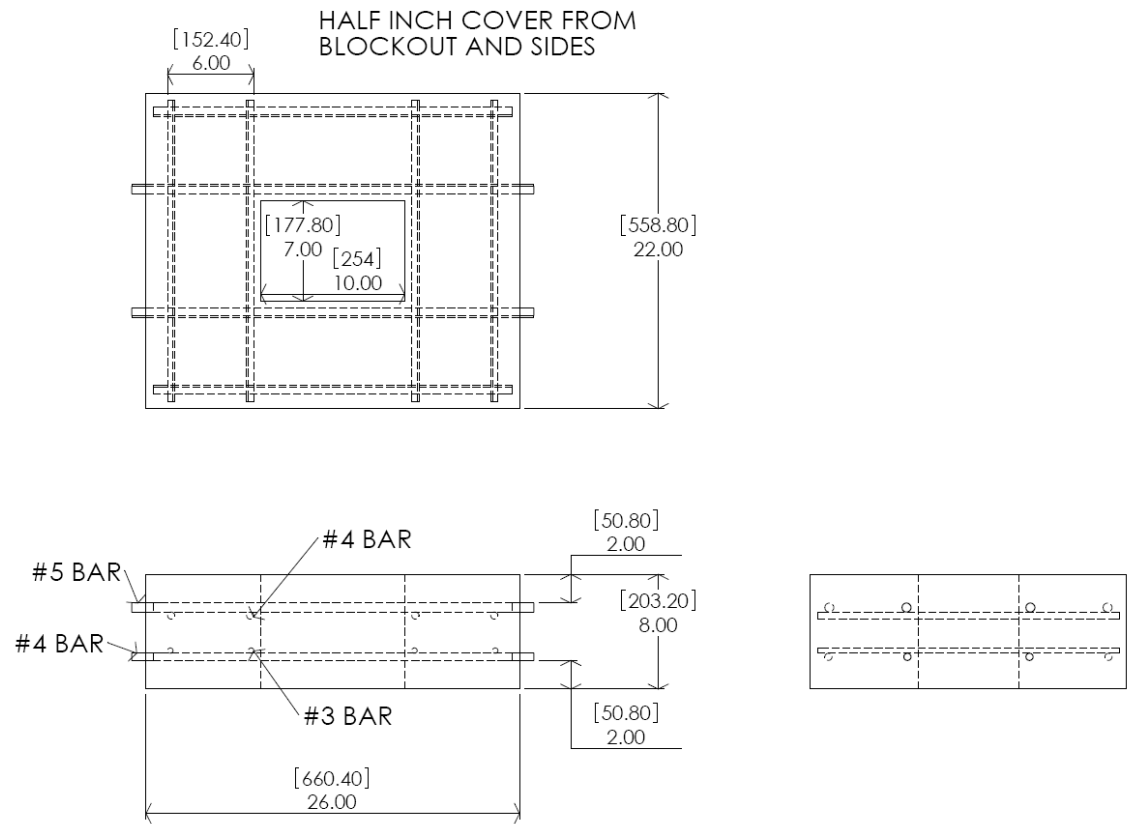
Typical reinforcement layout of precast shear deck specimens.
